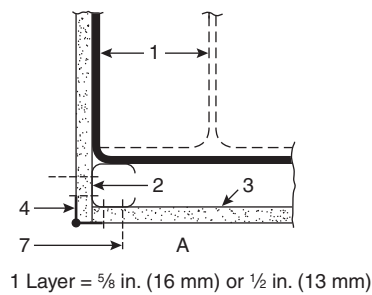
Attachment mechanisms of gypsum wallboard to steel columns.²⁵
